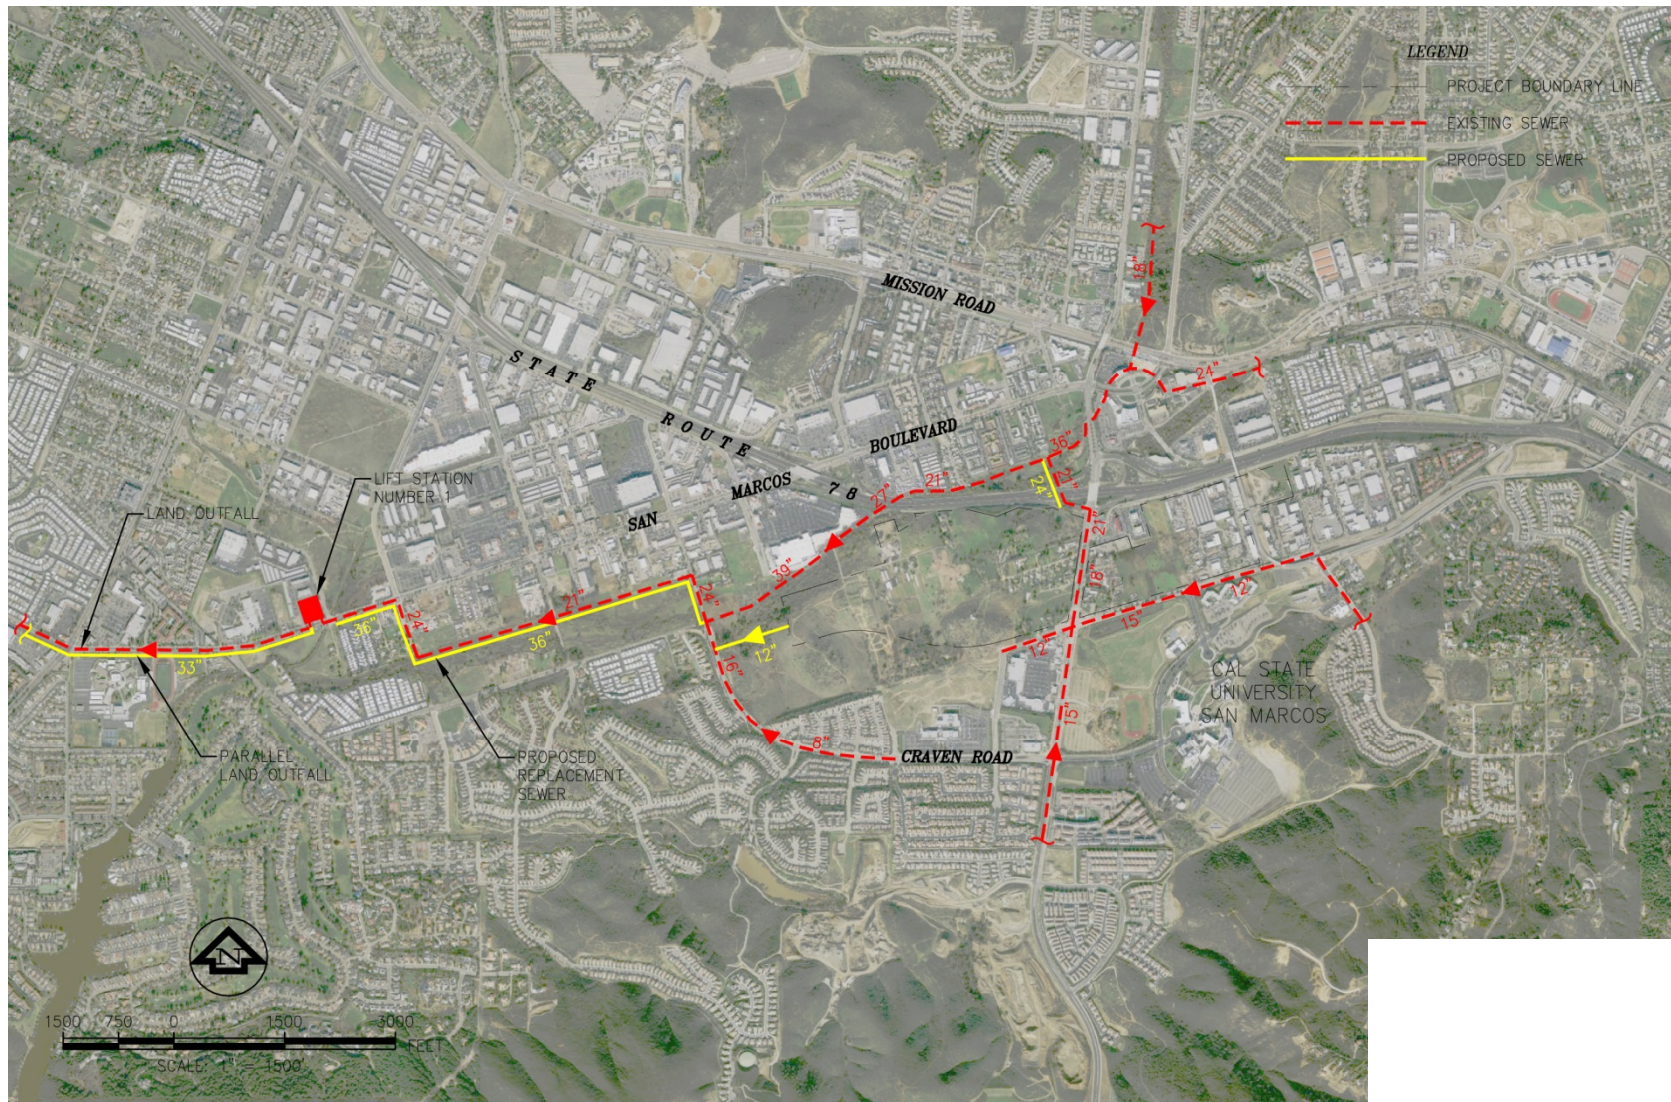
FIGURE VIII.E: Proposed Off-Site Sewer Facilities
